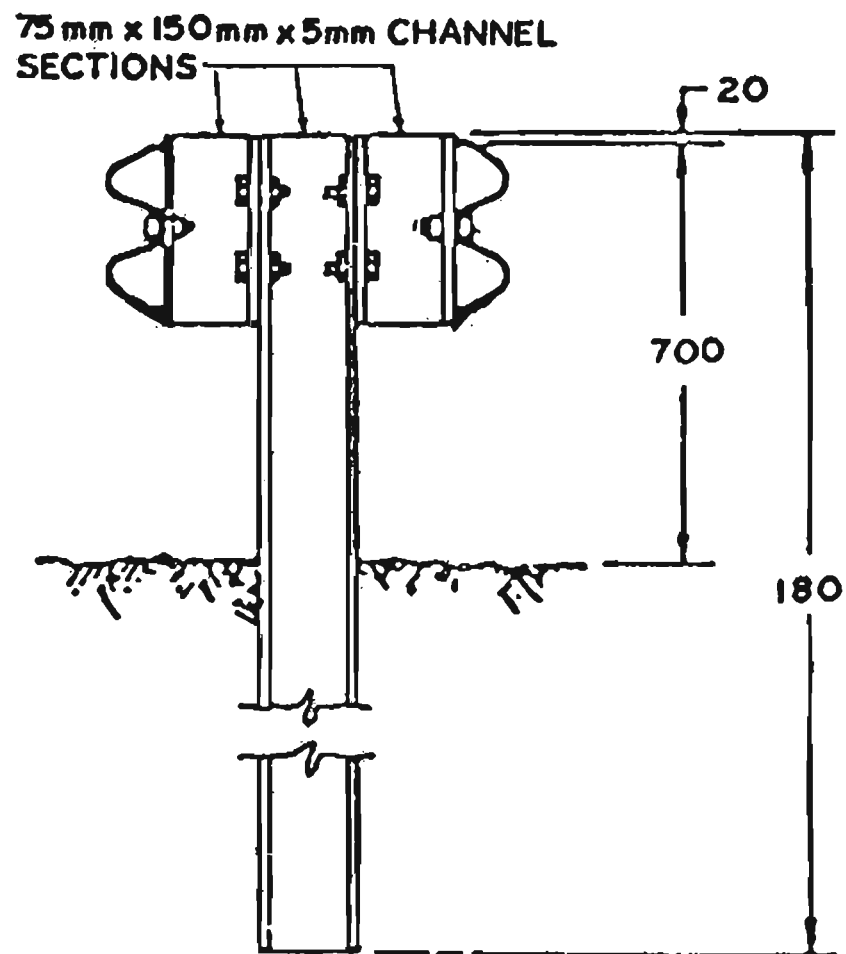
TYPICAL DETAILS OF "W" BEAM MEDIAN
